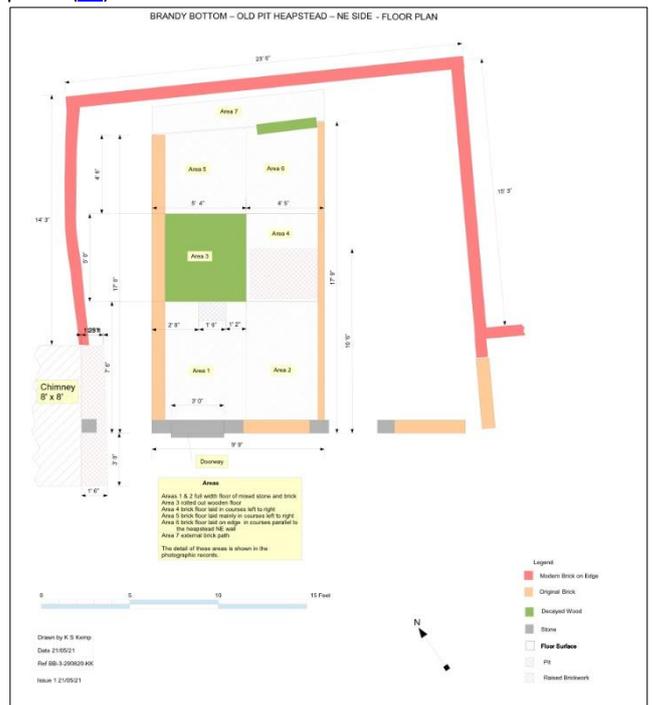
Drawing of the floor of the building at the north-east end of the Old Pit heapstead. (See comments on p.2, BB-3-290820-KK, © K Kemp)
